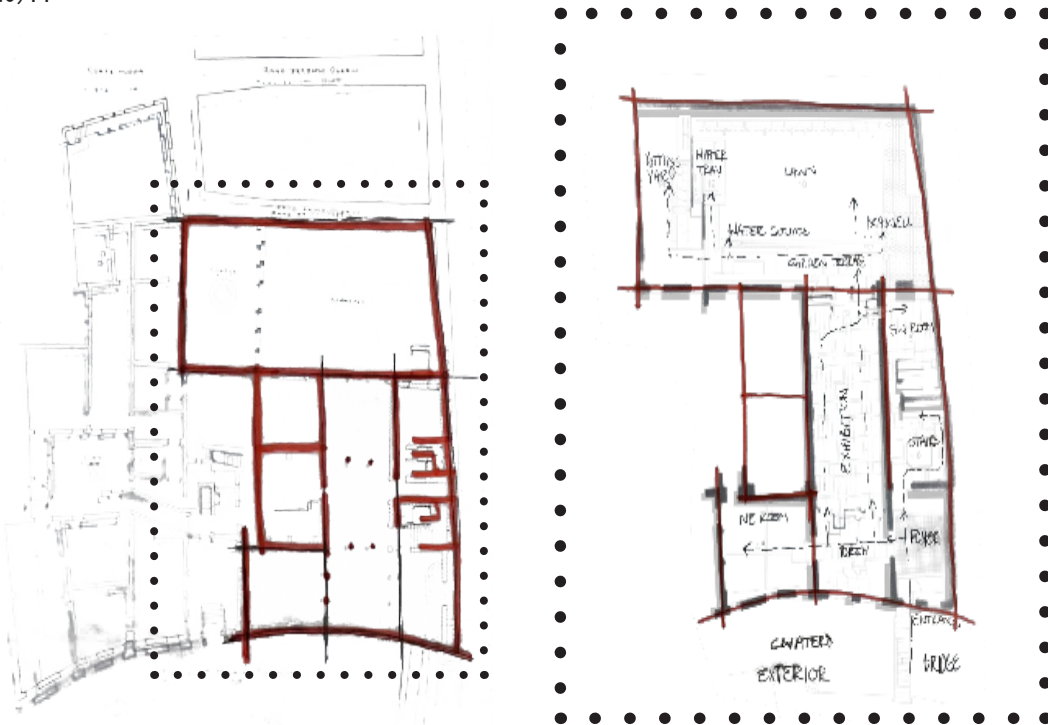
Original plan on left, the red showing the exiting walls (de Cal, 2019).
